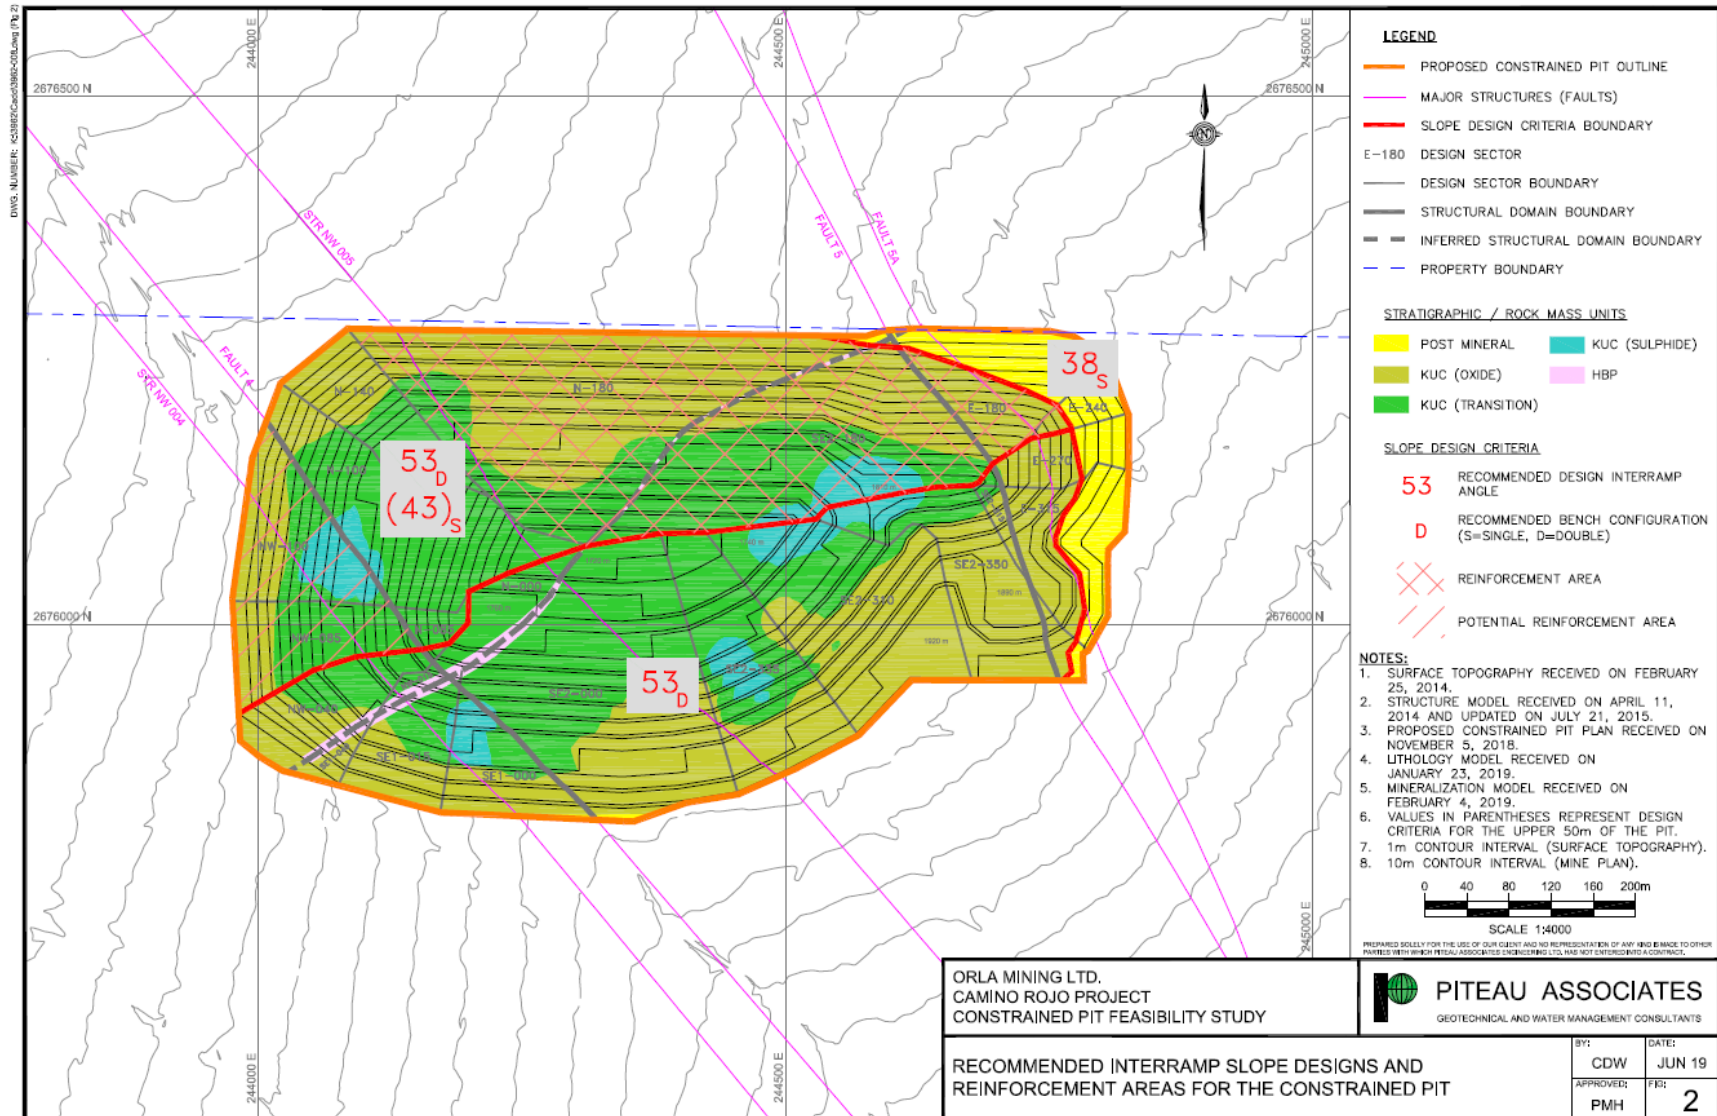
Slope Angle Recommendations, Piteau 2019
